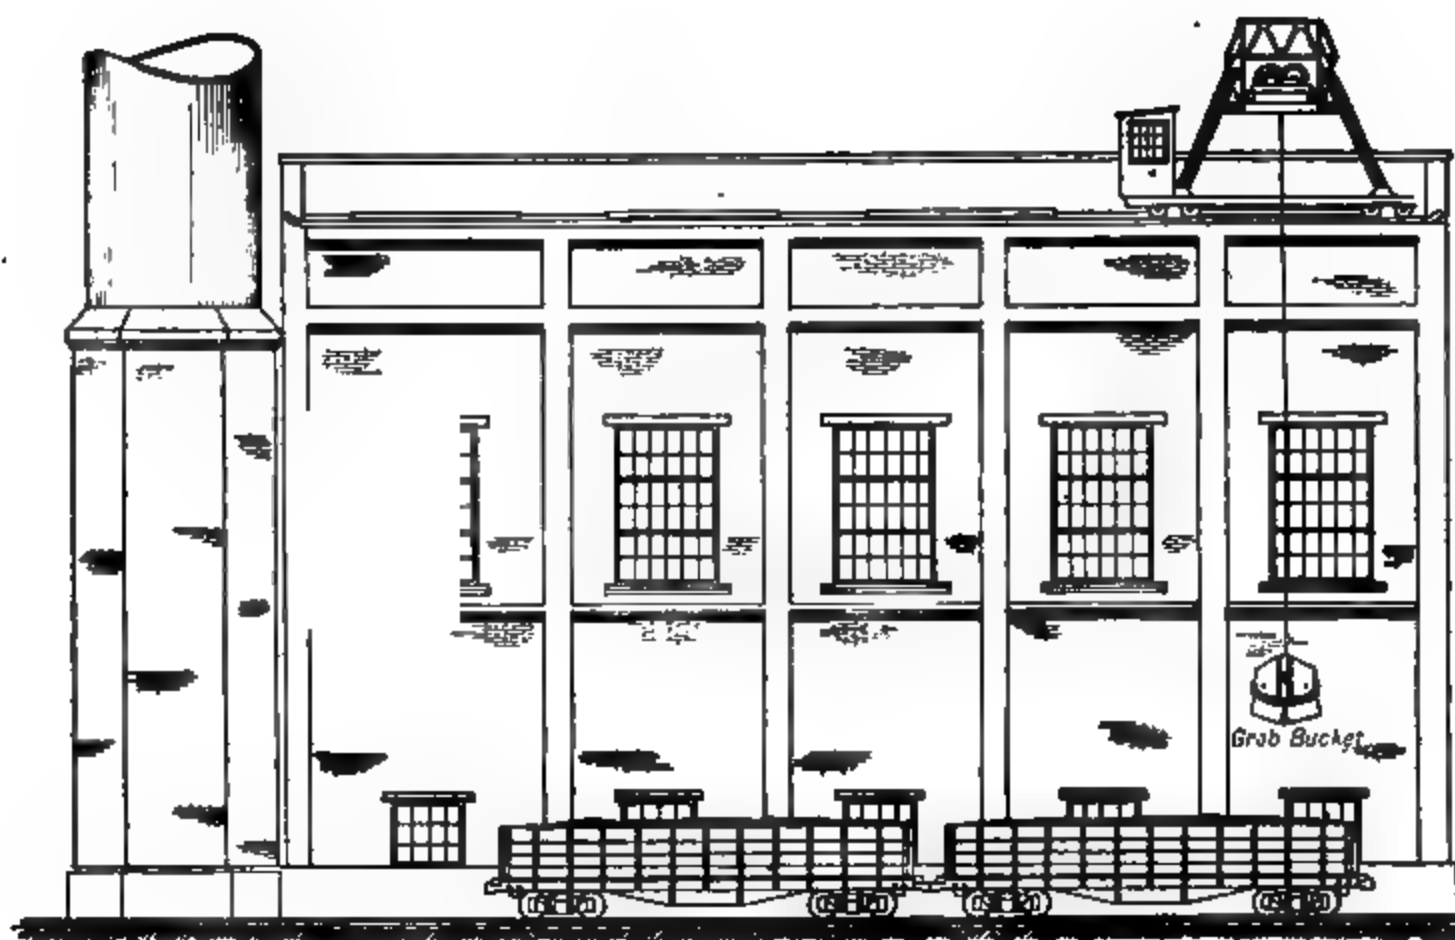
JEFFREY COAL HANDLING EQUIPMENT.
